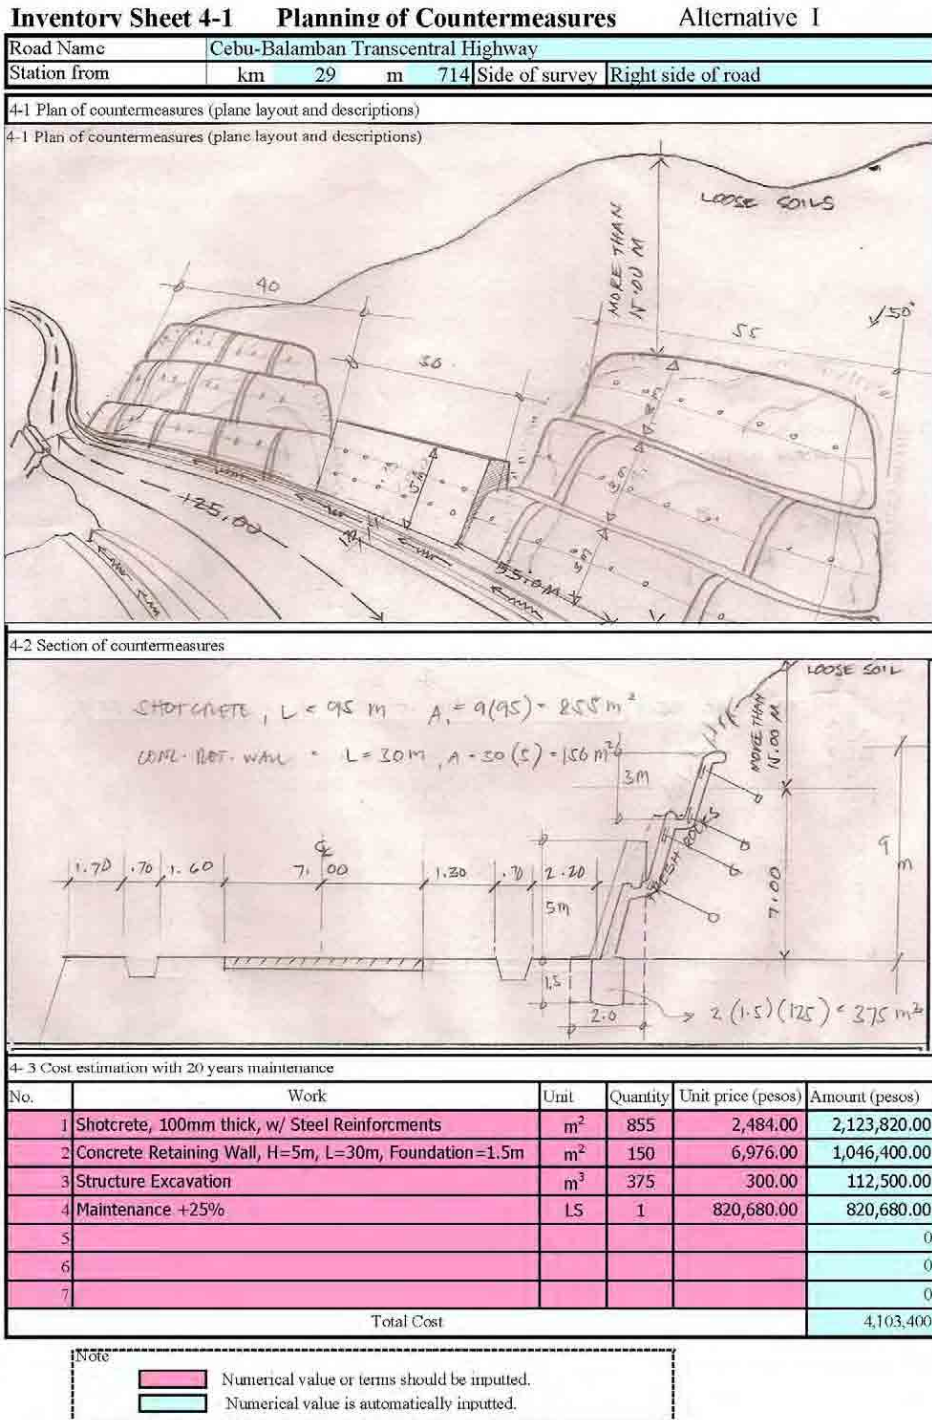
Example of Inventory Sheet 4-1: Planning of Countermeasure Alternative I for Soil Slope Collapse
